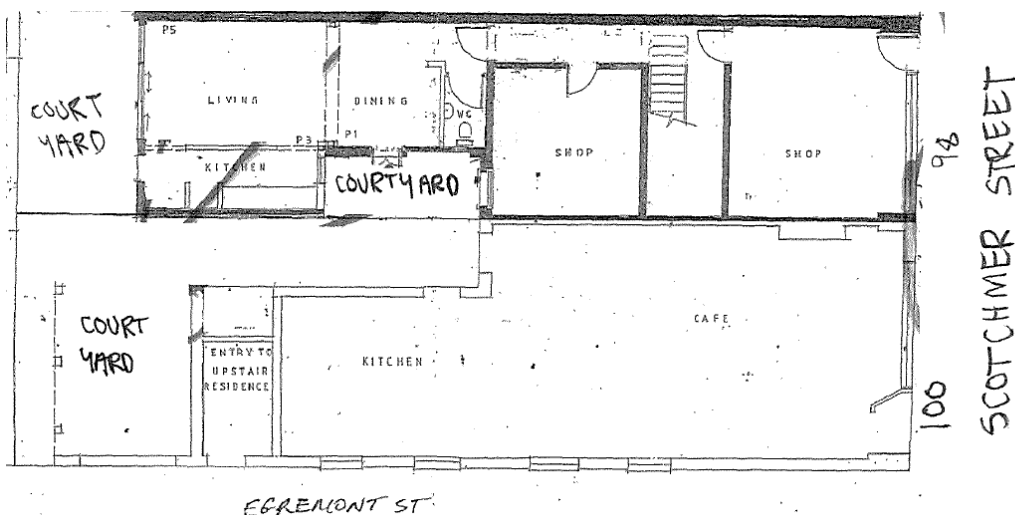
The subject site at the intersection of Scotchmer and Egremont Streets.
